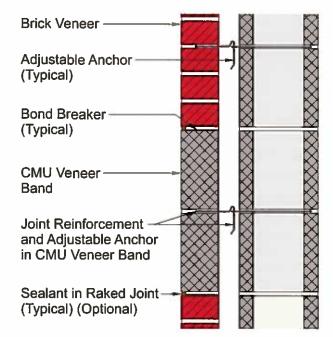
Multi-Course Concrete Masonry Band in Brick Veneer
